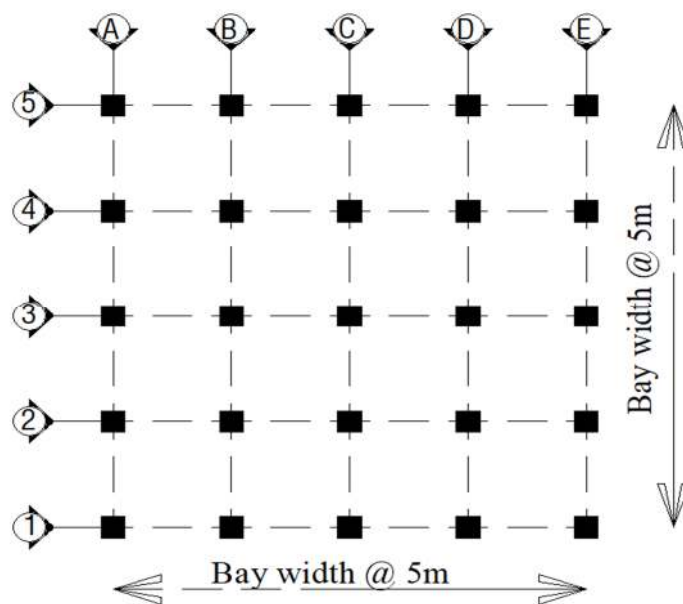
Plan view of 4, 6 and 10-storied buildings
